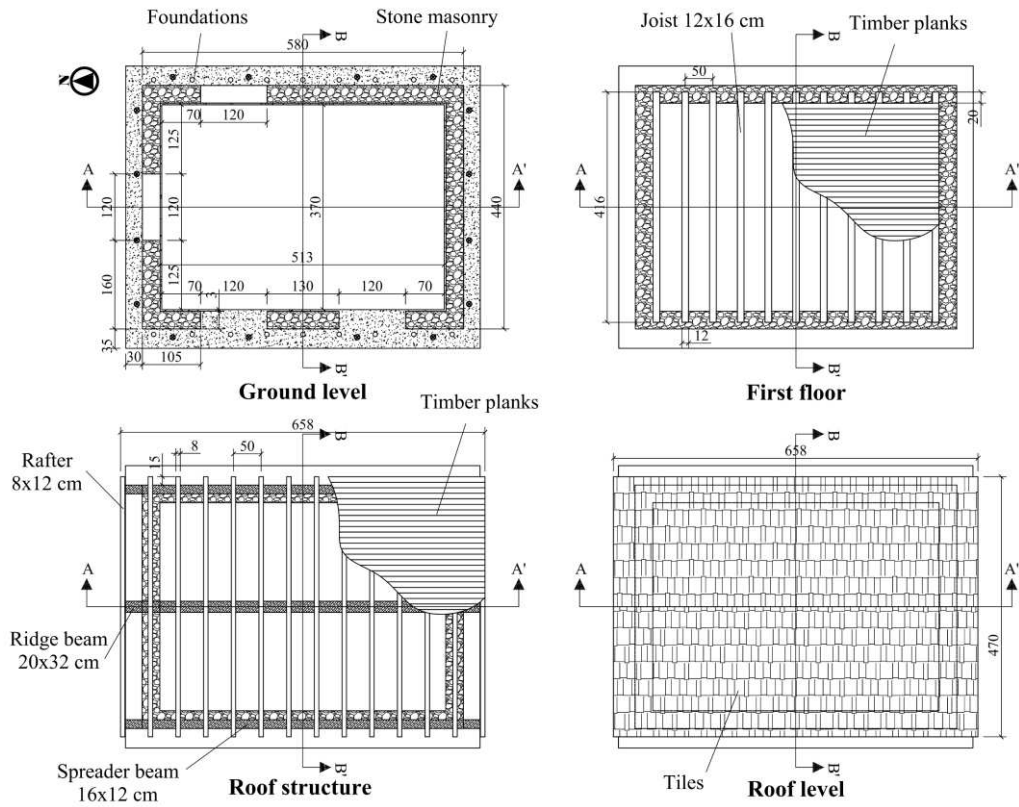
Plan views of the reference building prototype (Building 1). Units of *cm*.
